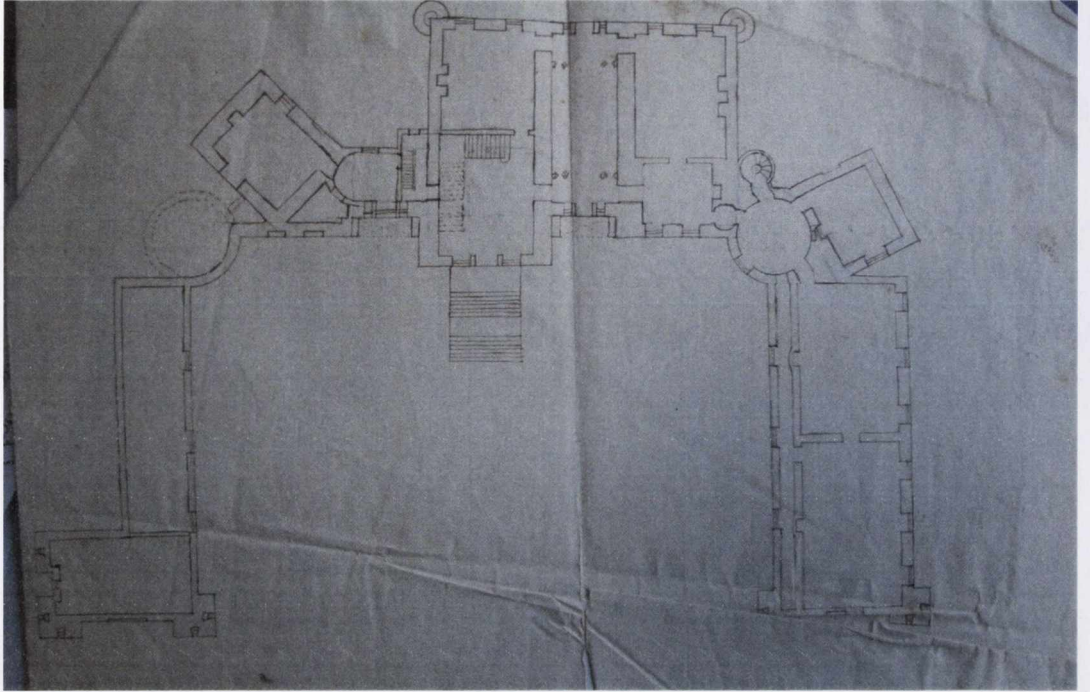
Birr Castle, proposed ground floor plan, attrib. to John Johnston, [1801], Rosse papers, O/17/8.
